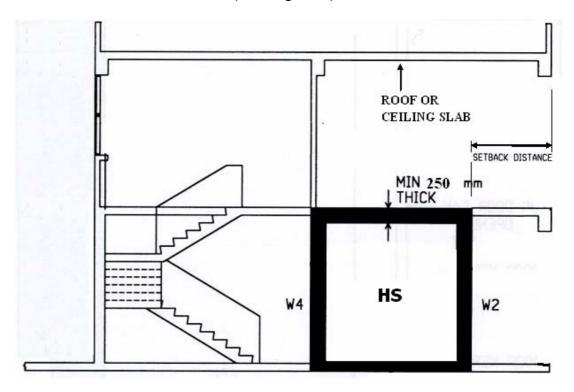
Minimum dimensions of the ceiling slab of HS in landed dwelling unit
